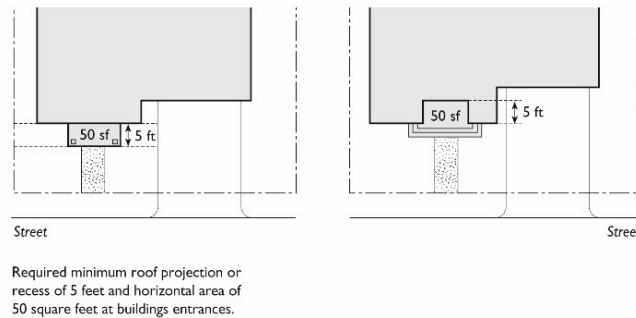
D.3.C: BUILDING ENTRANCE PROJECTION OR RECESS
